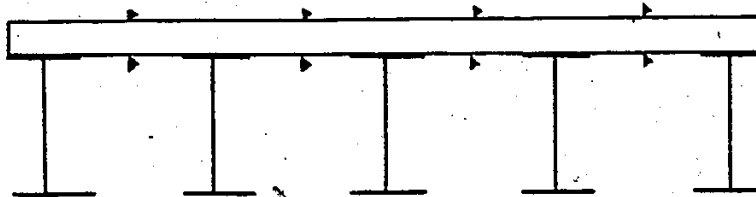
REINFORCEMENT STEEL FOR THE NON-PRESTRESSED PORTION OF THE SLAB.
